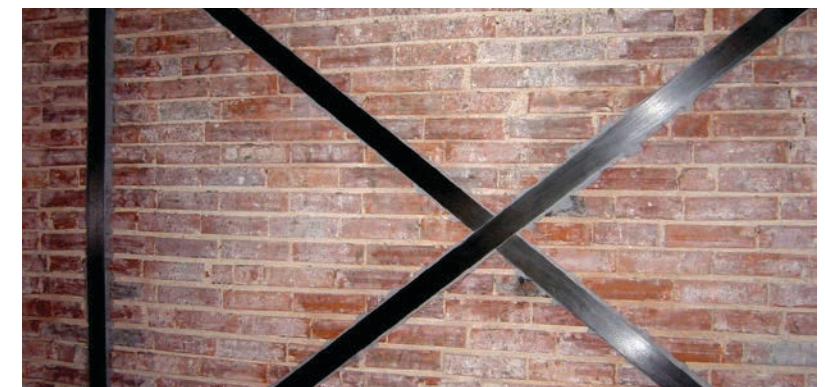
Strengthening of masonry walls with carbon fiber strips
